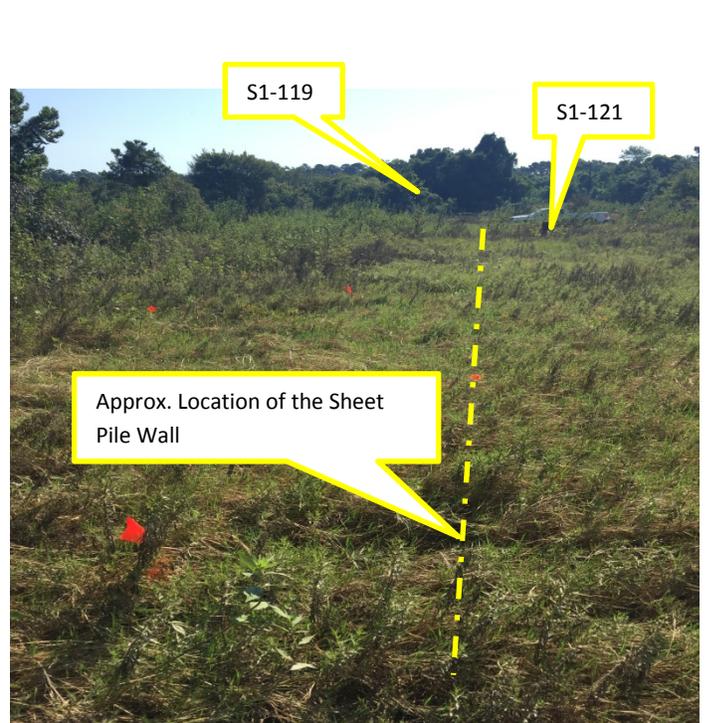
Soil sampling grid located inside sheet pile wall looking East.
